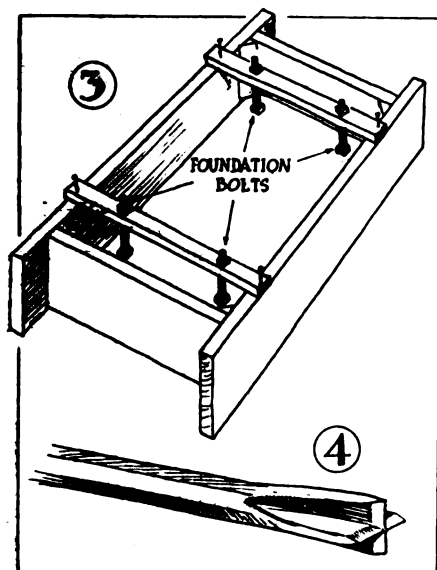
Method of inserting foundation bolts in concrete base. Fig. 4—Type of drill used for foundation bolt holes if the bolts are to be inserted after the concrete is hard
